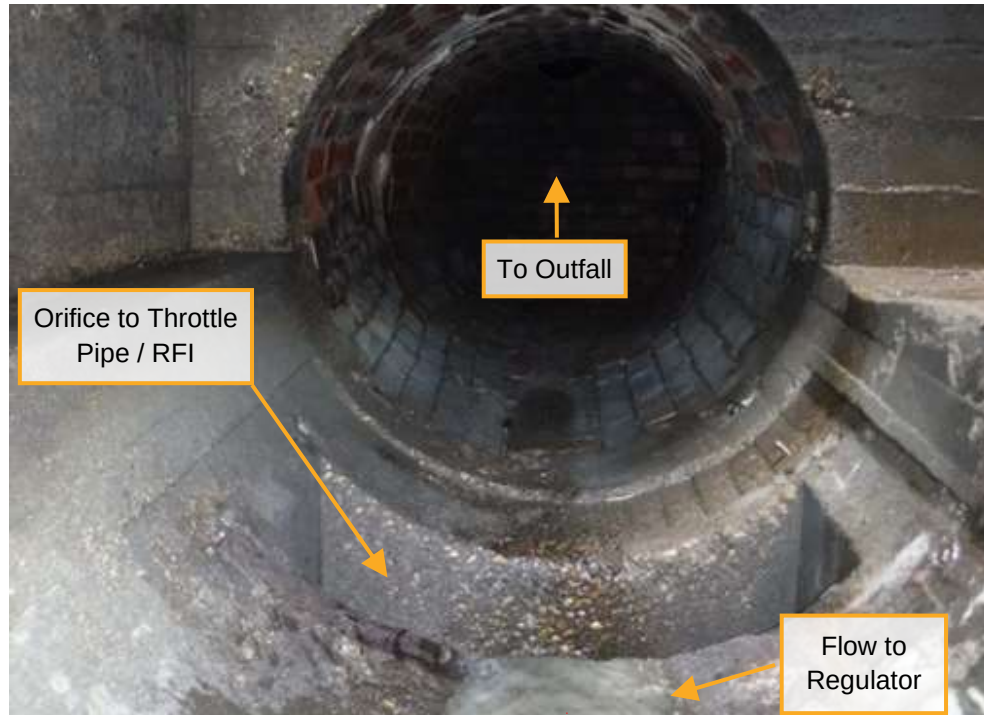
| Sanger – Washington West Regulator, Facing Downstream Toward Outfall
